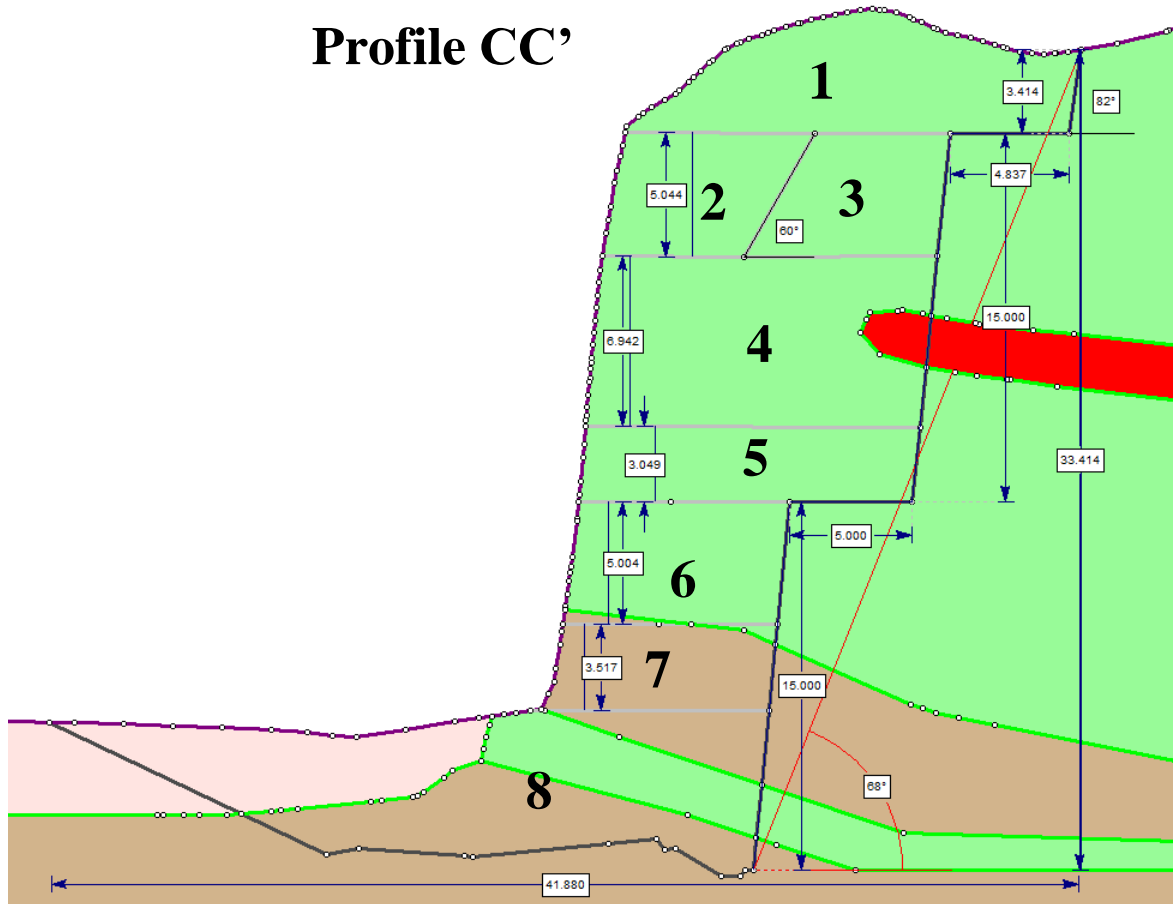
Excavation sequence for profile CC'. The excavation area is 471 m<sup>2</sup> and the excavation perimeter is 138 m<sup>2</sup>.
